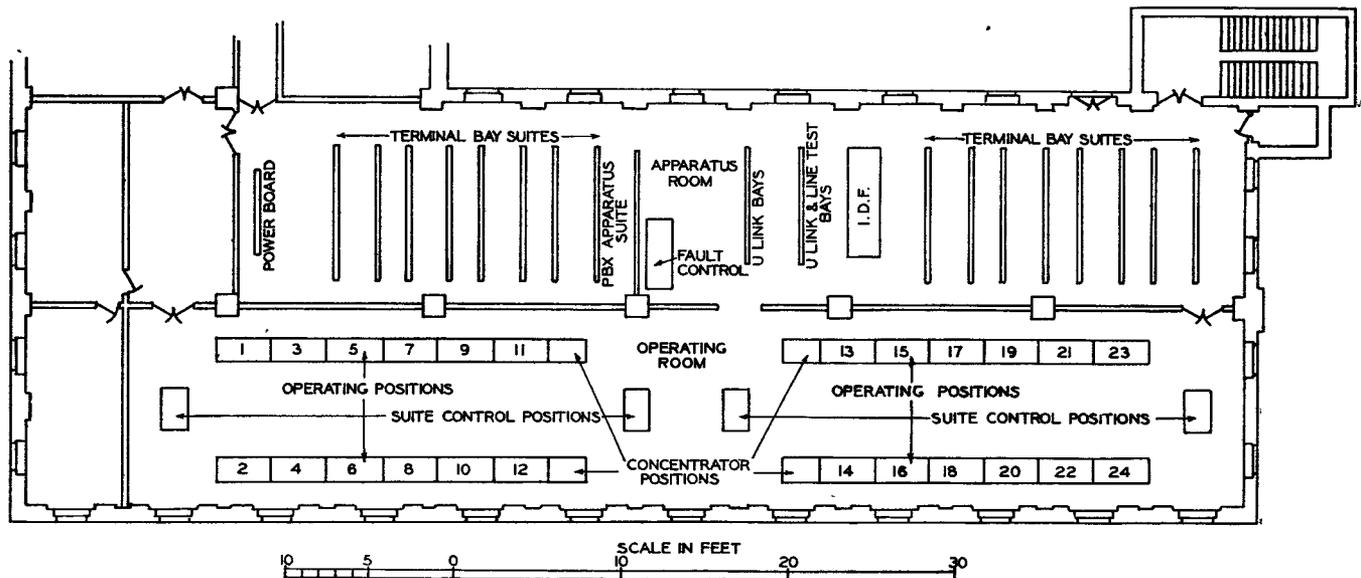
LAYOUT OF EQUIPMENT ON 1ST FLOOR AT BRENT R.T.T.
